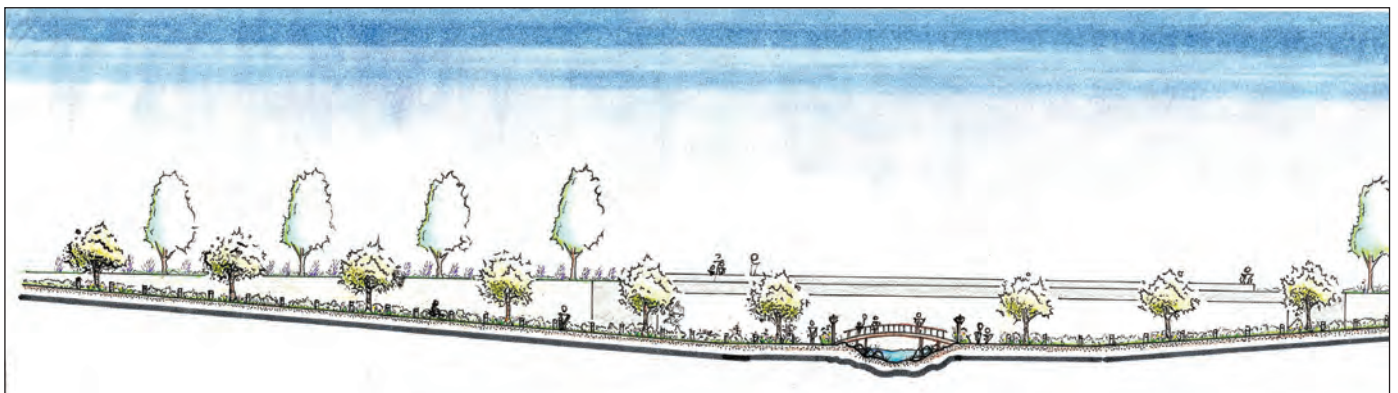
Section of Park of the Americas showing gentle ramps from the existing First Street and bridge area providing continuous pedestrian and bicycle paths to San Lorenzo Creek.
